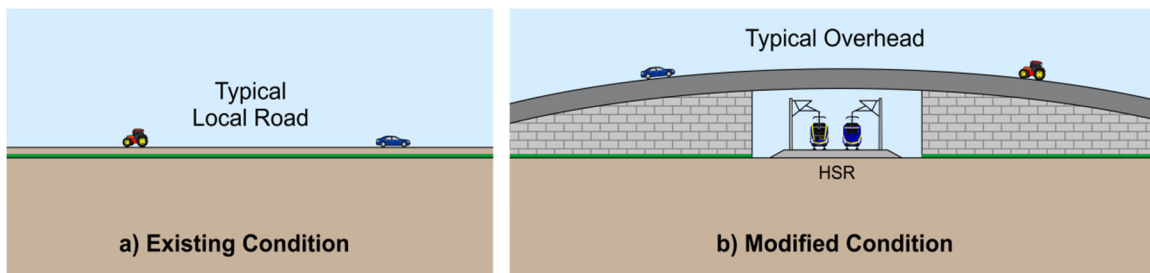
Adding Local Roadway Overheads above the High-Speed Rail Guideway
